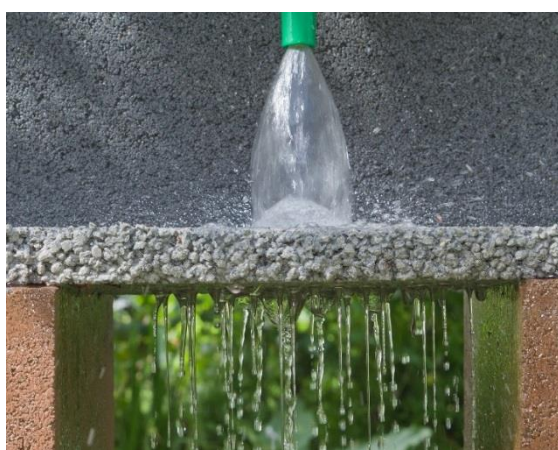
Pervious concrete surface layer demonstration (Harrison, 2011)
